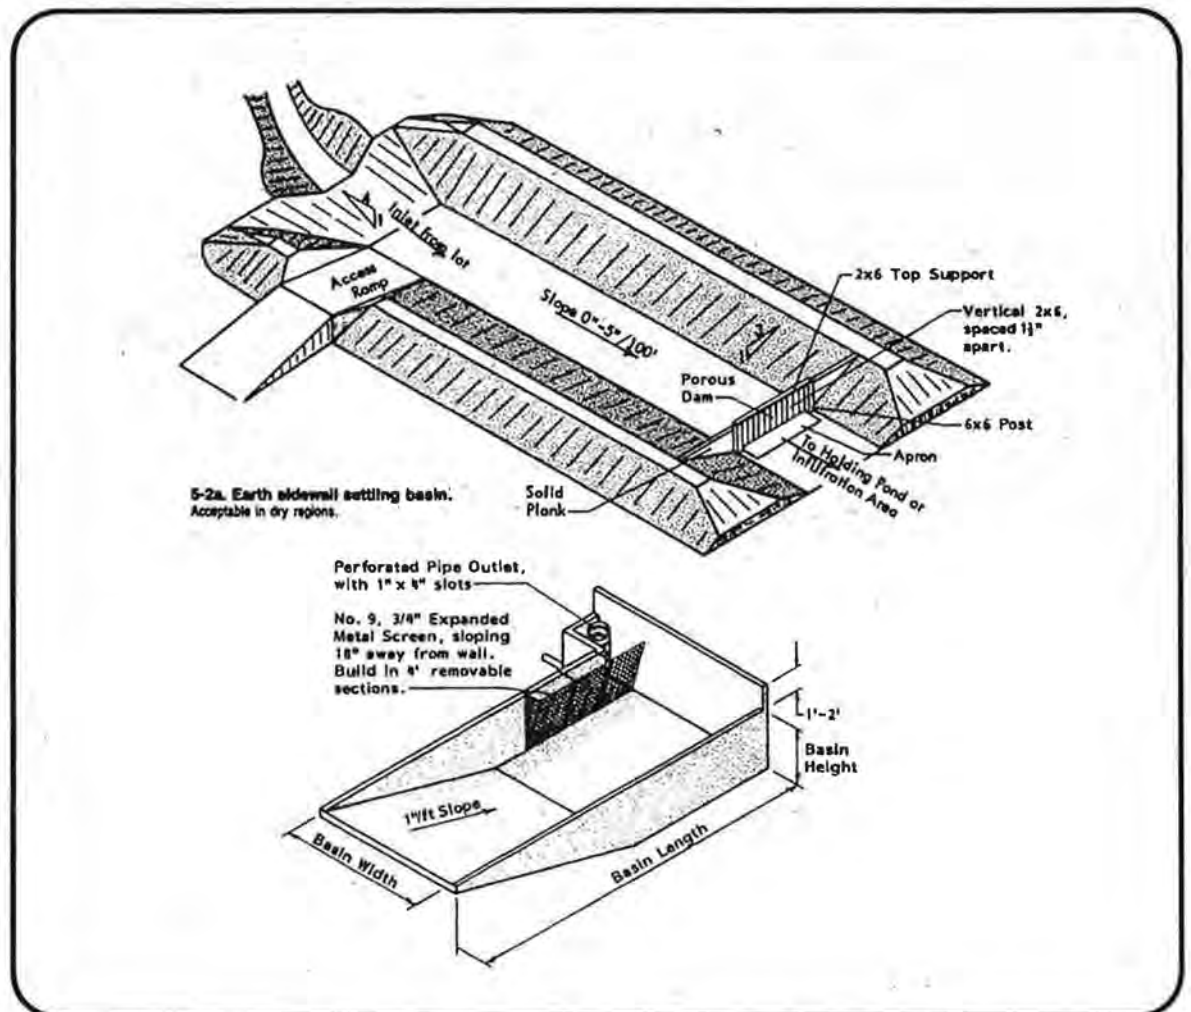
Settling basins. Source: Livestock Waste Facilities Handbook, Midwest Plan Service, 1985.
